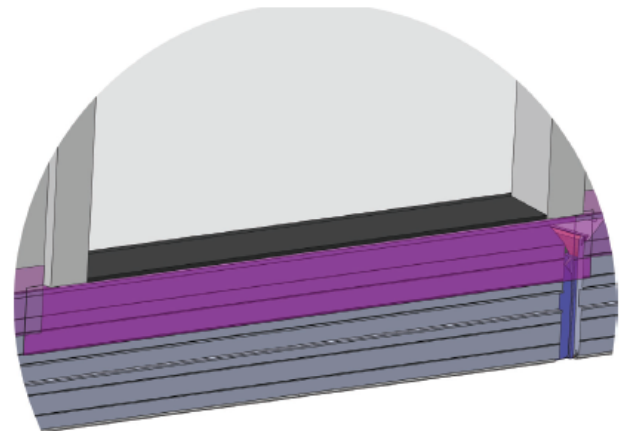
HORIZONTAL TAPE DOOR DETAIL
